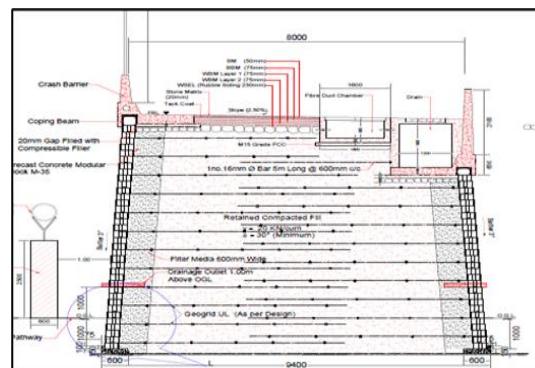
Typical Cross Section of WBM Road (Re Wall Section for Max. Height) Applied for Section- From Ch.-320.00 To 588.00
